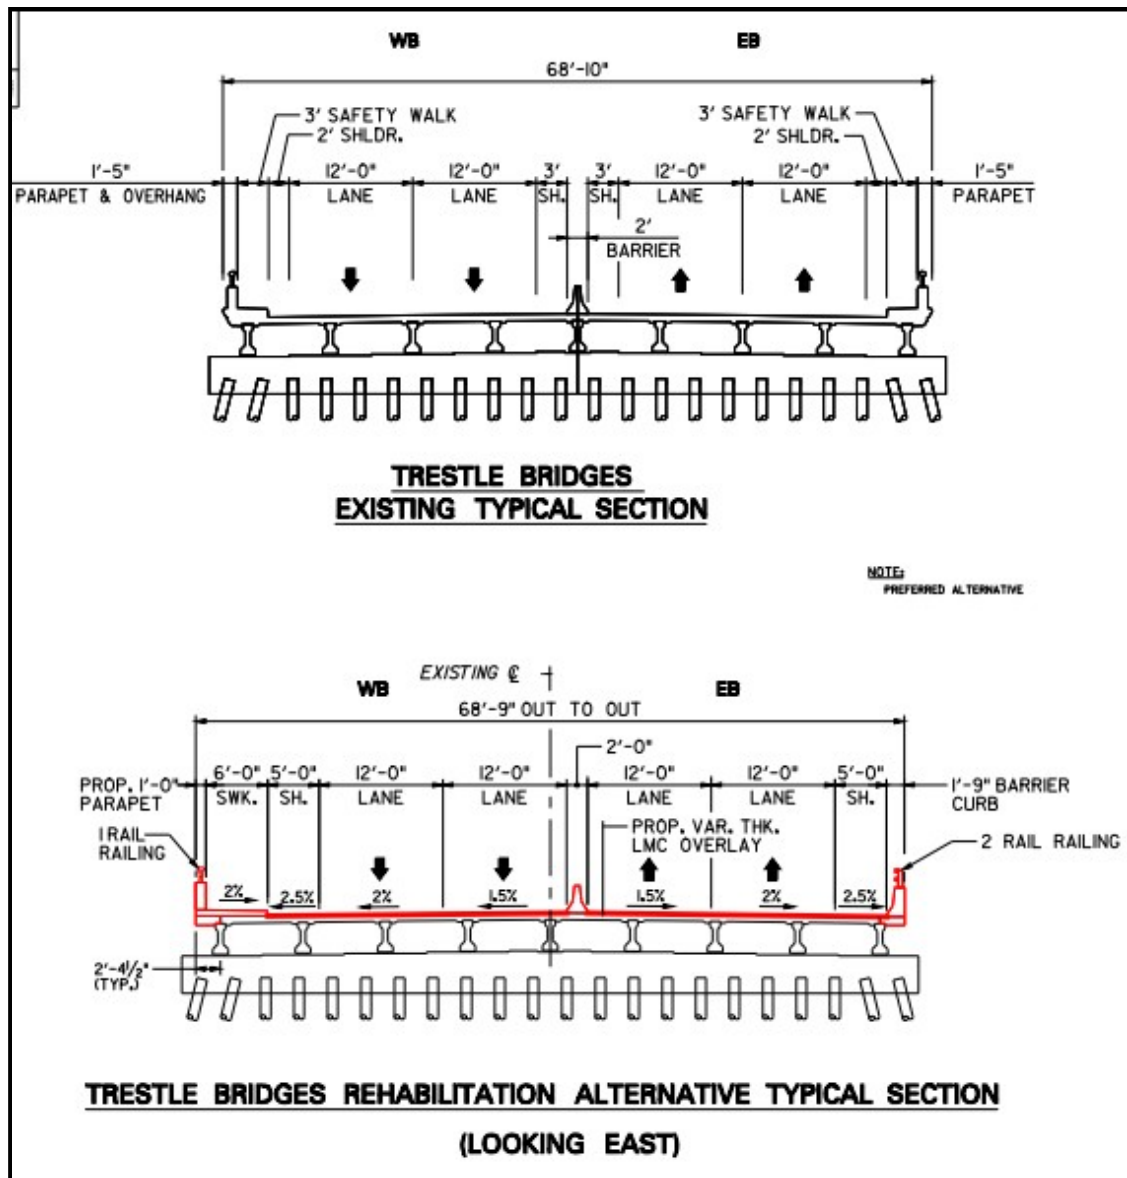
Trestle Bridge Typical Sections (Existing and Alternative 1 – Rehabilitation)
